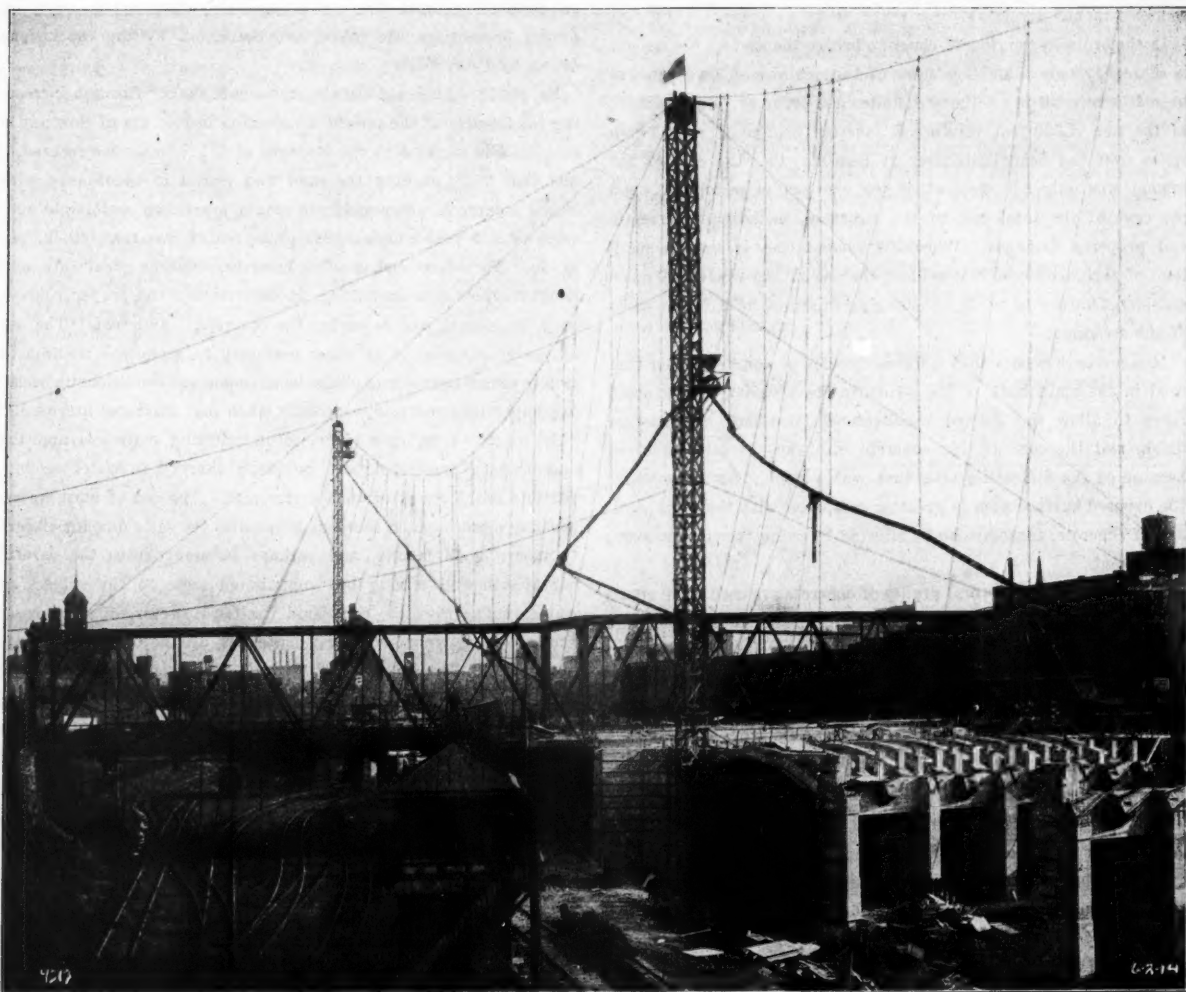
Complete Concrete Distributing System—Following Viaduct, Baltimore, Md. Type of Viaduct Construction Shown in Foreground.
